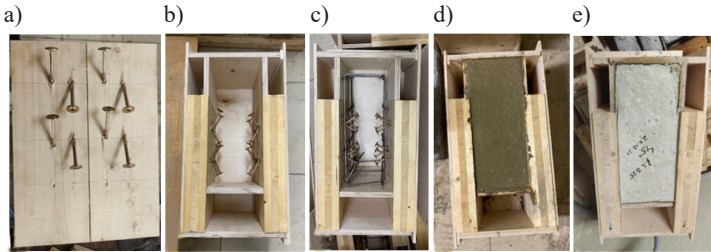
Stages of specimens preparation: a) screws installation; b) formwork assembly; c) reinforcement installation; d) concrete casting; e) the specimen after development of strength
